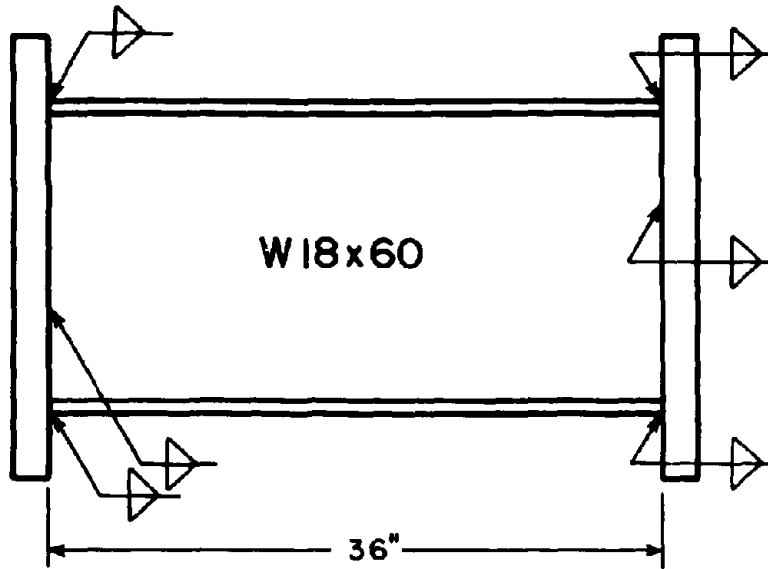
Section and Connection Details of Specimens 16 and 18.
